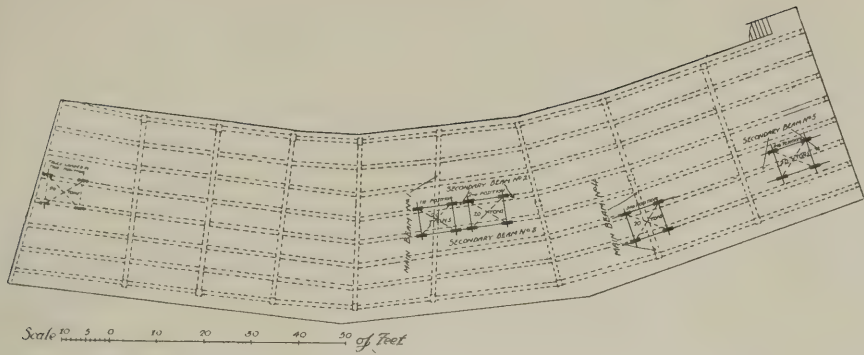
DIAGRAM SHOWING FOUR POSITIONS OF TEST LOAD.
